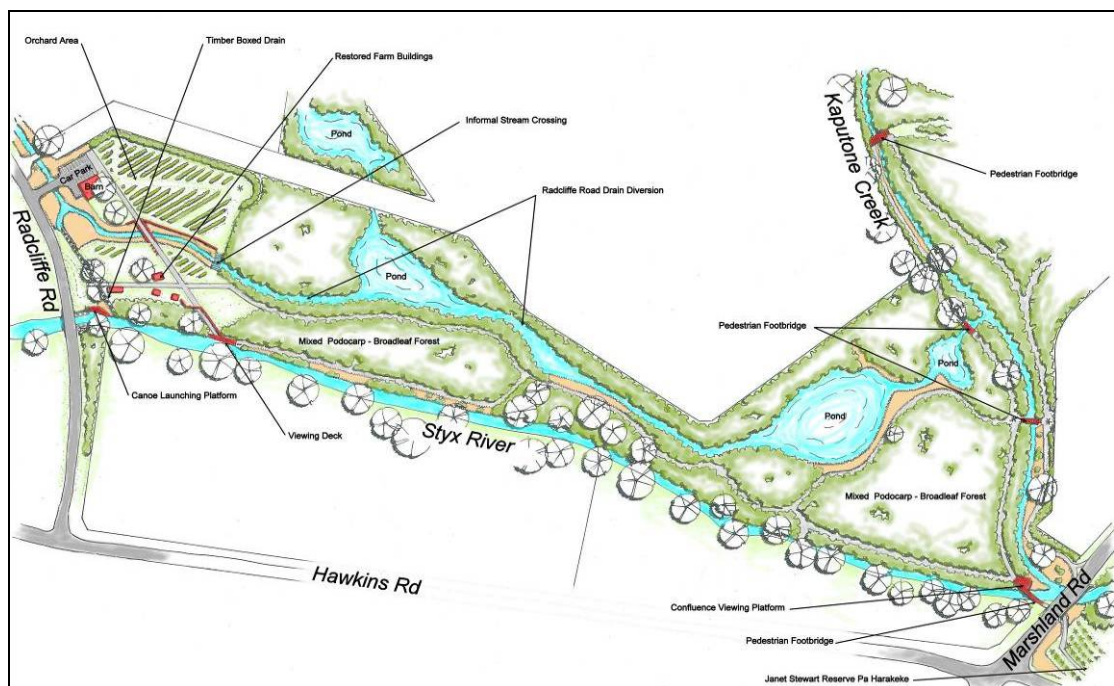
Landscape concept plan for 303 Radcliffe Road site showing significant waterway restoration of Radcliffe Road Drain, Kaputone Stream and Styx River and associated forest restoration.
